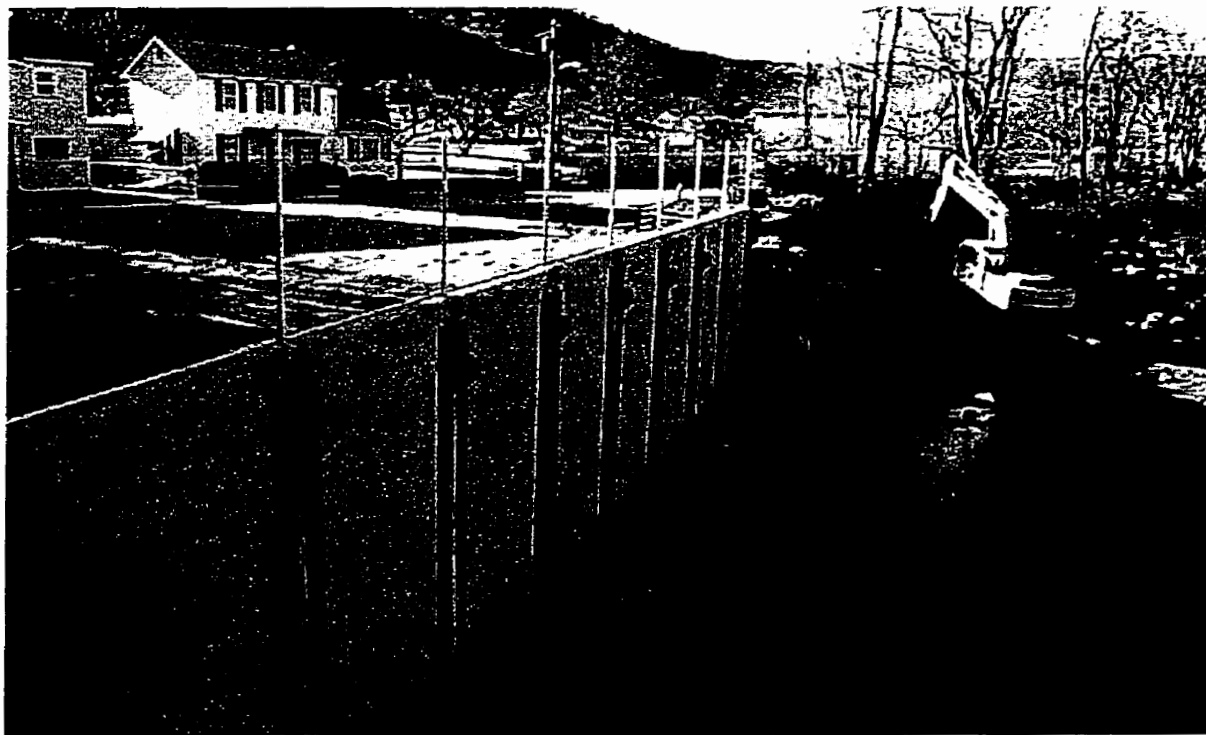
Large Concrete Flood Wall Source: U.S. Army Corps of Engineers
